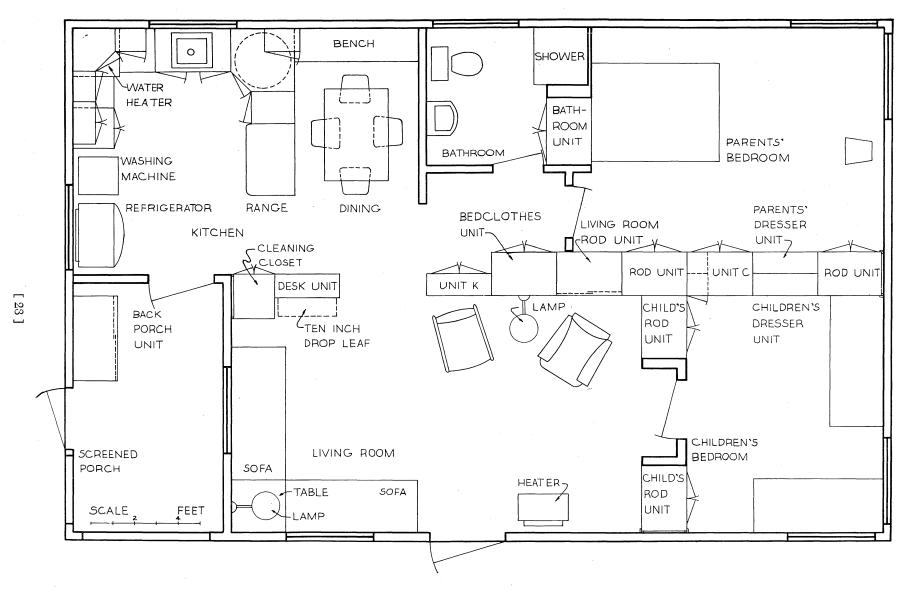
Plan of storage-wall laboratory, original arrangement.
